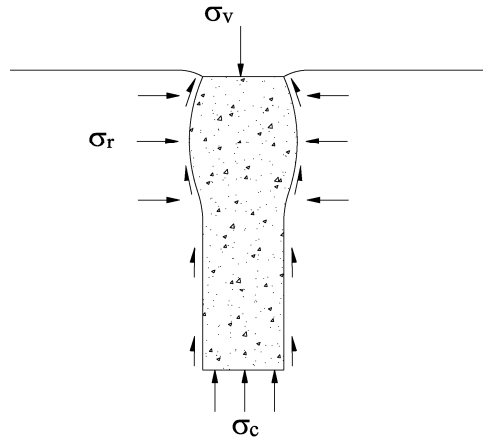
Bulging failure and stresses acting on a single stone column under vertical load
